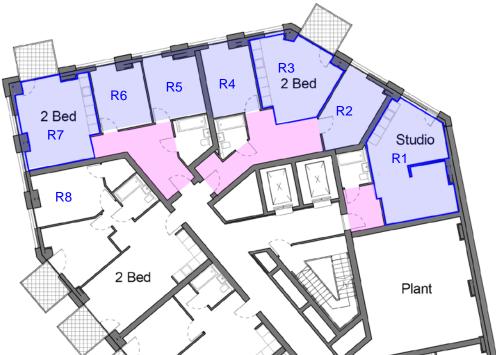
Annotated extract from first floor plan of North Island Building No. 3 (drawing no. TH-IS_ZZ_001_A_16092_(P00)_P101 rev. P00). Room references in blue font (R1, R2, etc.) are those used by Point 2 in its impact assessment. Rooms shaded blue are habitable rooms that take light from over the Site. Areas shaded pink are hallways/circulation spaces.
